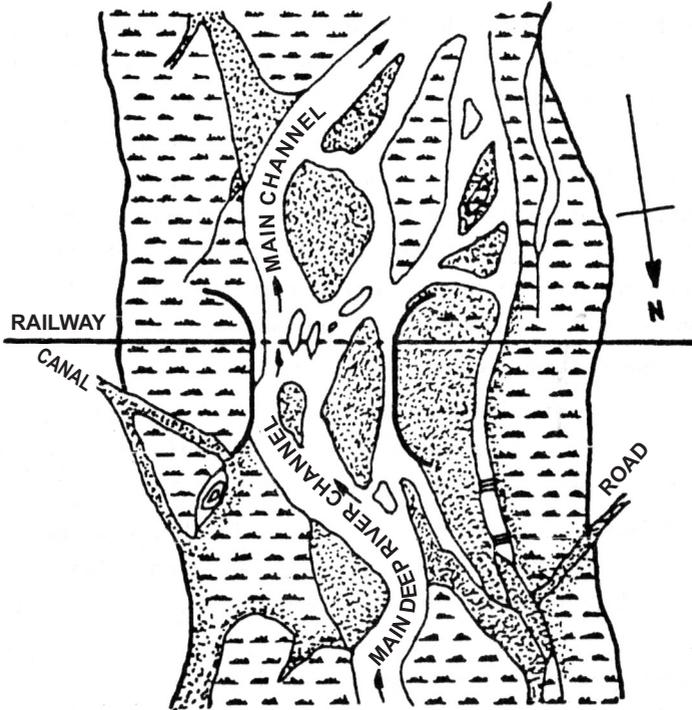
Railway bridge on Chenab river at Sher Shah
